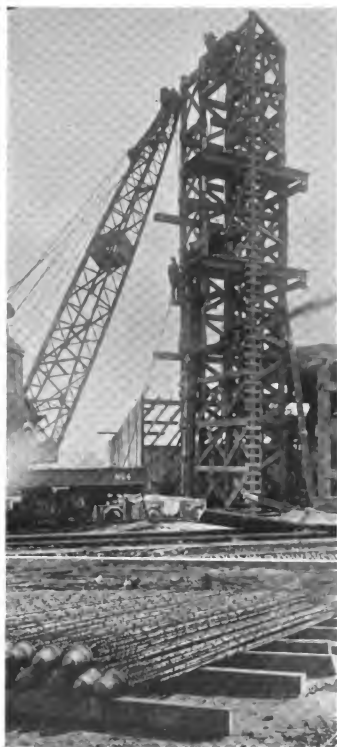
ABOVE IS SHOWN THE TOWER AND
